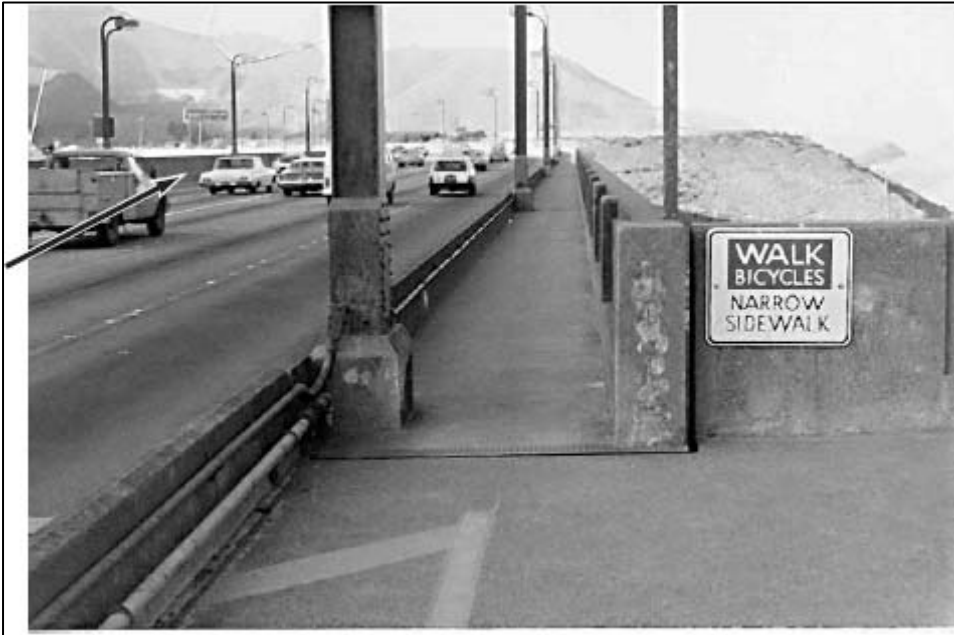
Photograph of east sidewalk, facing North Viaduct before 1980s sidewalk widening and extension projects. Arrow indicates no west sidewalk north of Pylon N1. (District, 2007 *Report of the Chief Engineer*)
